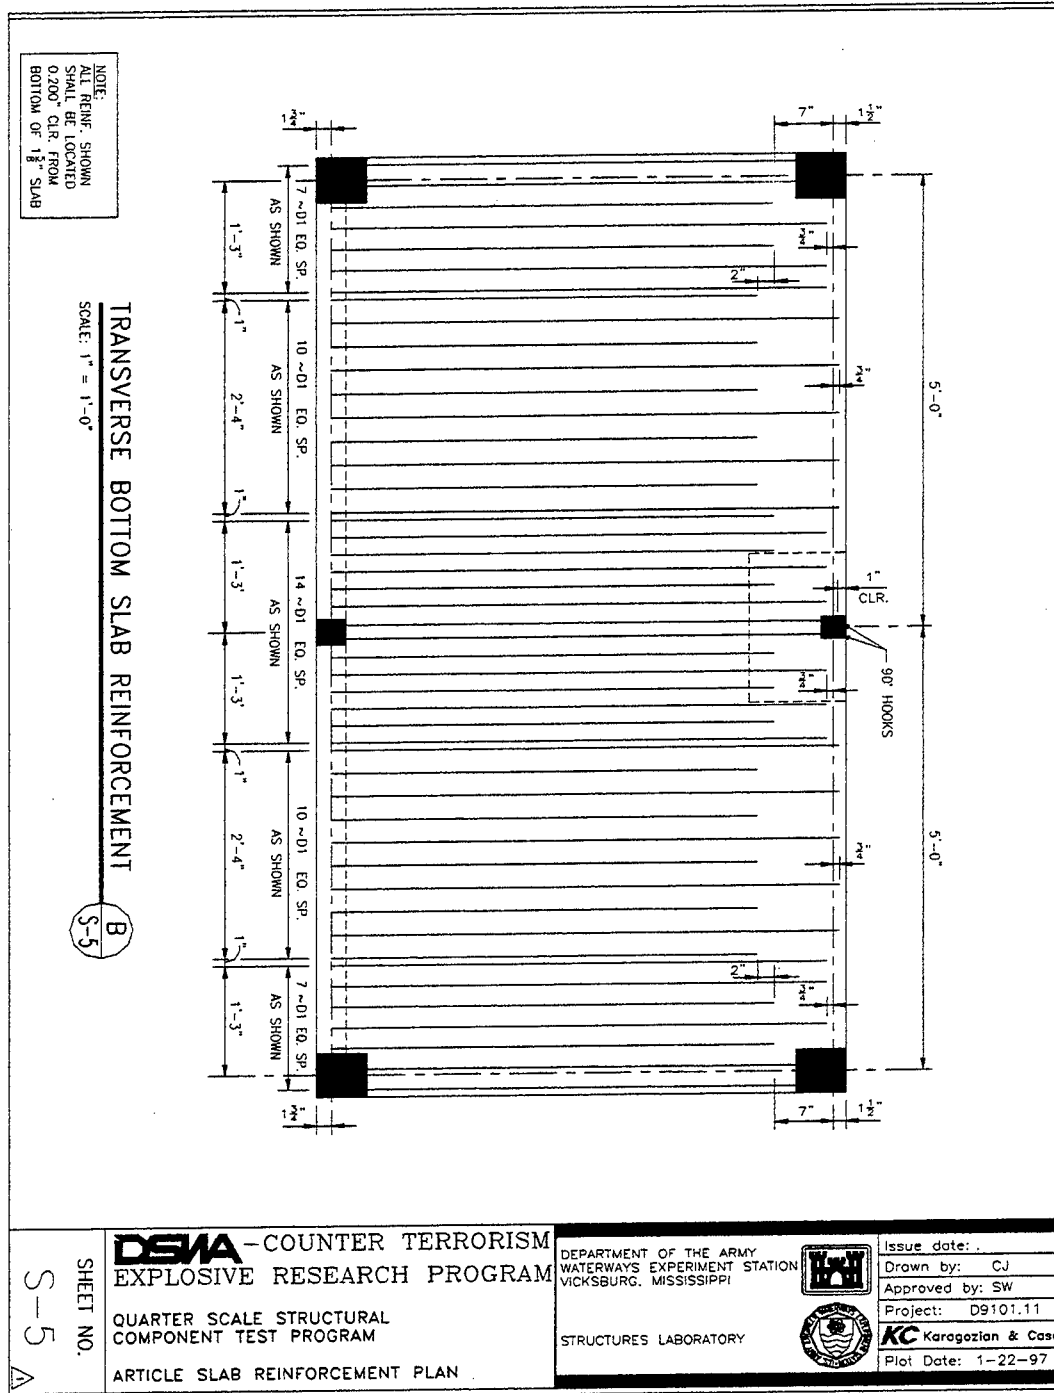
Slab Reinforcement Details, Bottom Transverse
